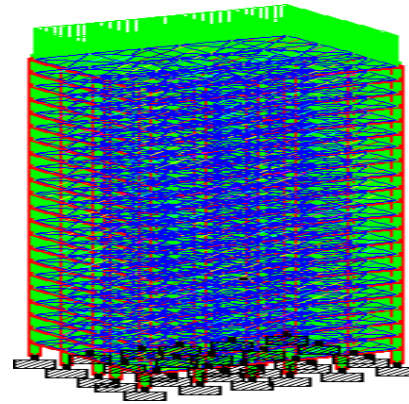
showing self-weight acting on 22 story building on 22 story building
